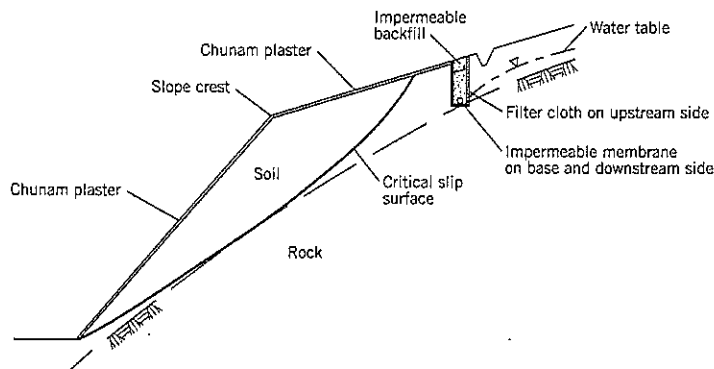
Typical use of chunam plaster to protect a soil slope in Hong Kong (after Geotechnical Control Office, 1984).
